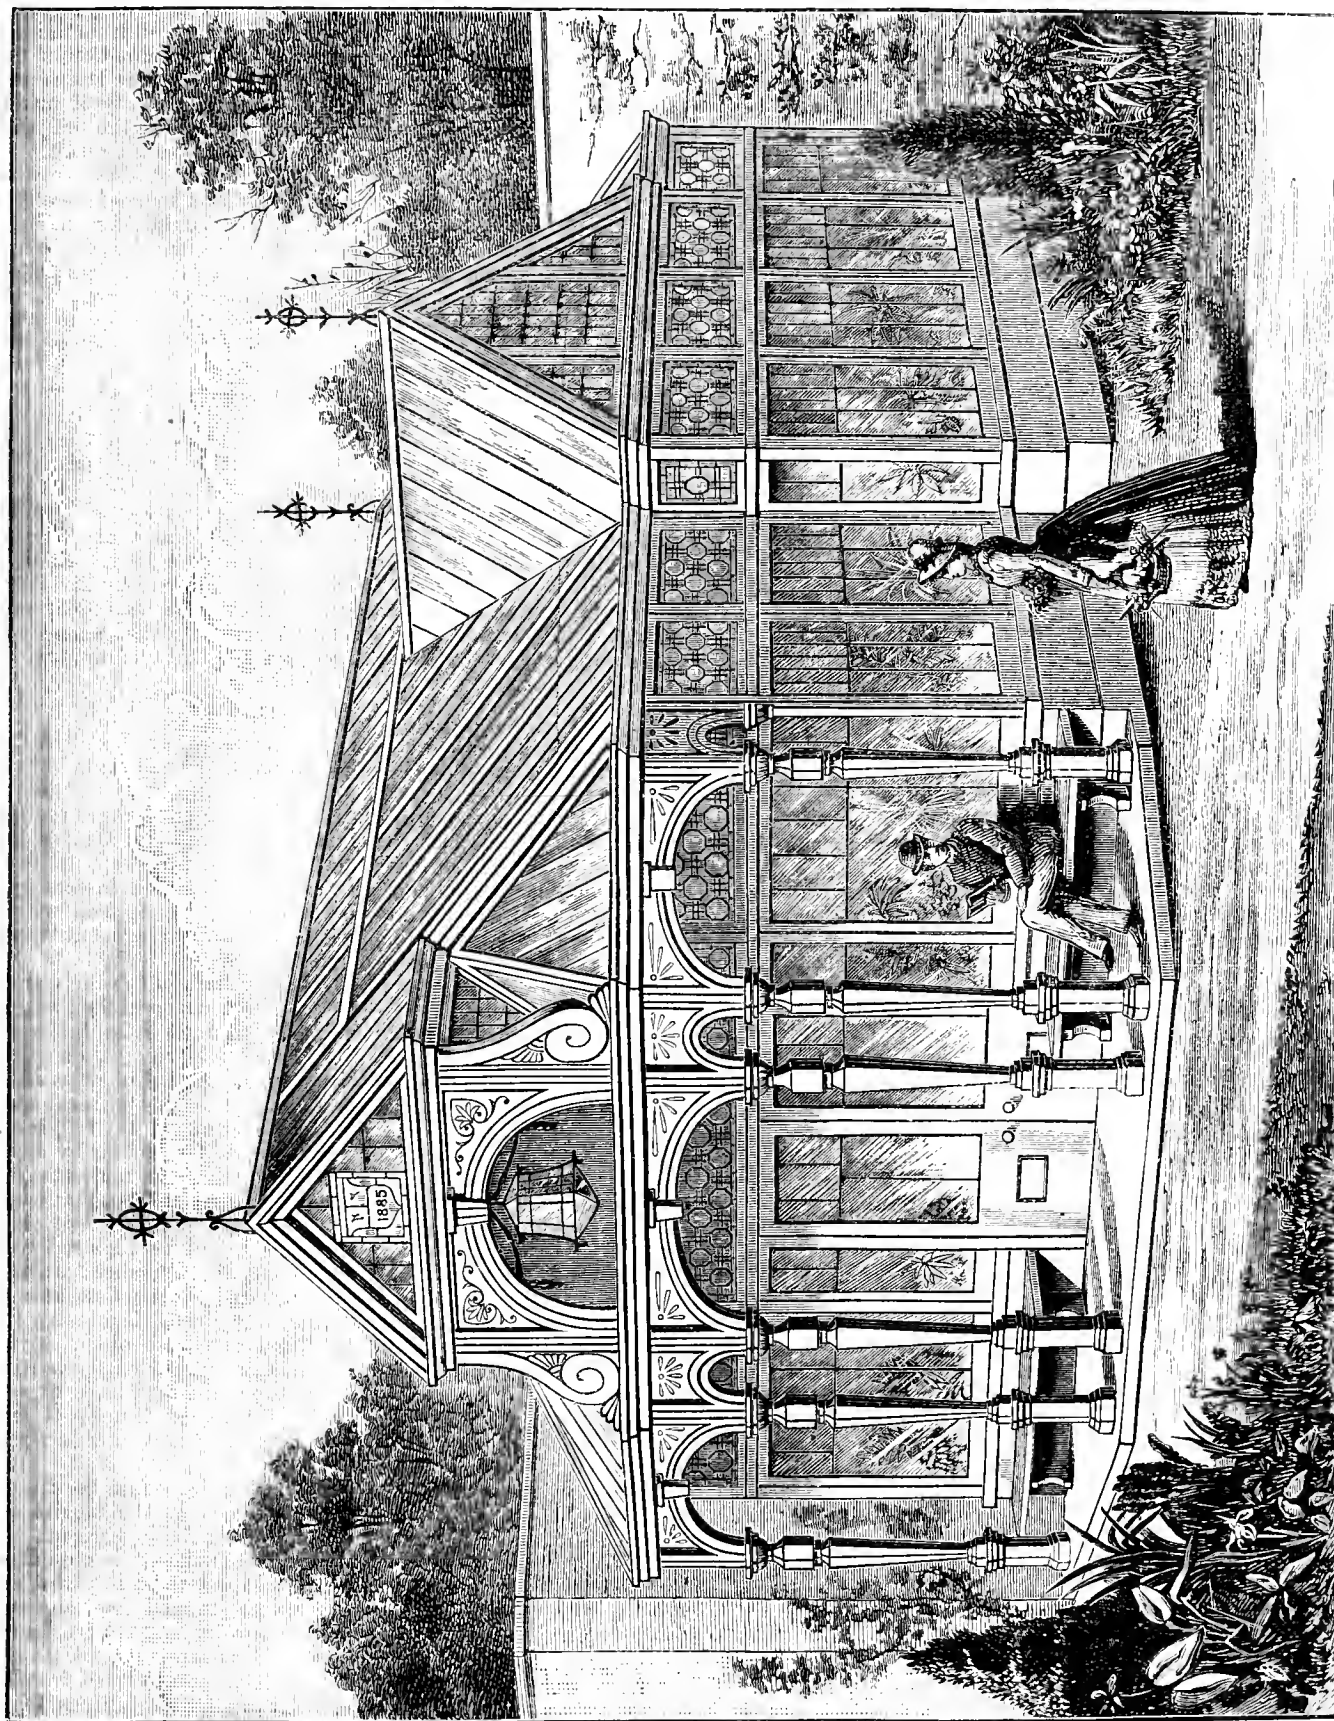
NEW CONSERVATORY, THE MANOR HOUSE, THAMES DITTON.
